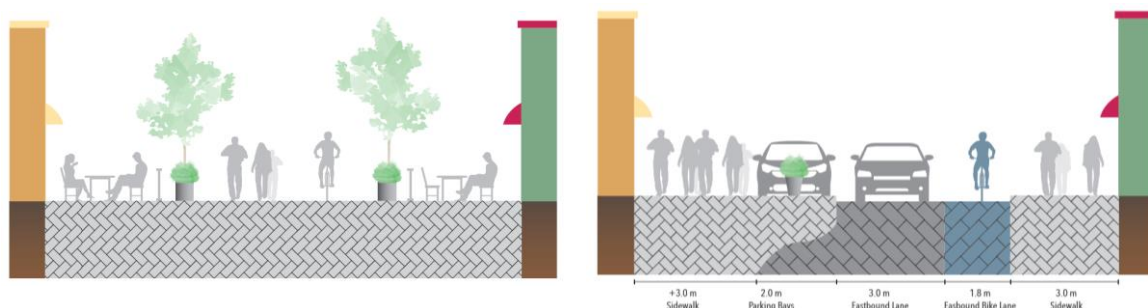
Example of a pedestrian mall (left) and shared space (right) for Montague Street between Duke Street to King Street
